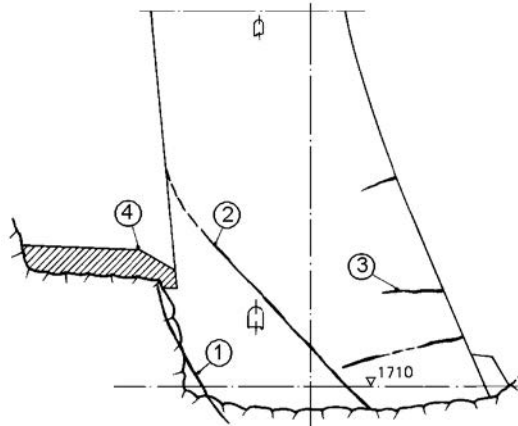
Lower part of the Kölnbrein Dam with cracks (Lombardi, 1991). (1) First group of cracks; (2) second group of cracks; (3) downstream cracks; (4) concrete blanket.
